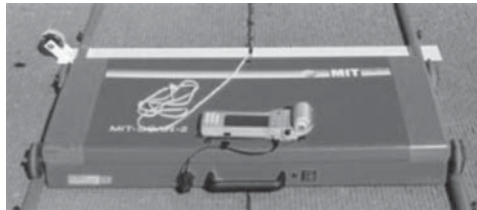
MIT scan equipment on rails on concrete slab. (Courtesy of FHWA, Atlanta, GA.)
